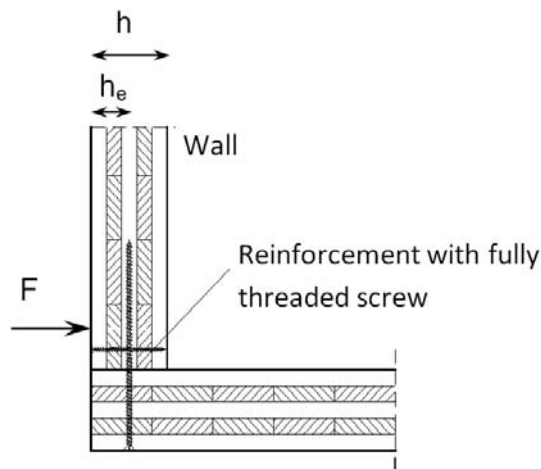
Reinforcement of a cross laminated timber wall with fully threaded screws.
